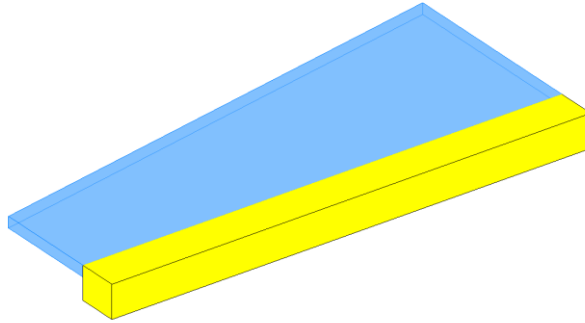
The prior calculation of the intersection between beam and floor is beam mass.
